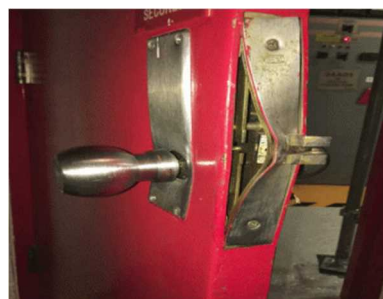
Photographs of damaged room door from outside the room [1]
